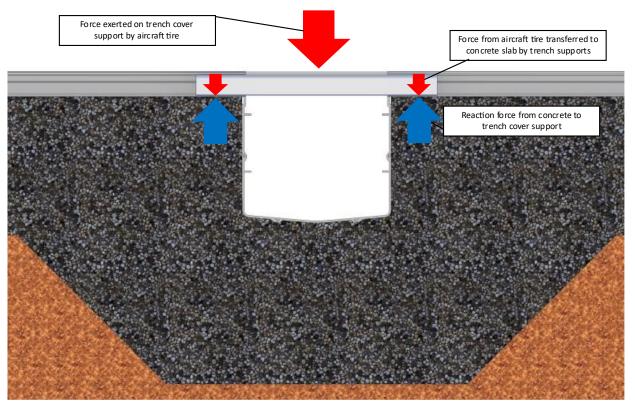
Rendering of aluminum trench and concrete slab showing force transferred from aircraft tire to concrete.
